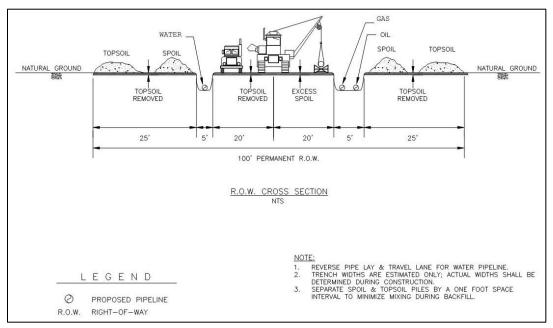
Typical Right-of-way Cross Section of Adjacent Pipeline Alignments
